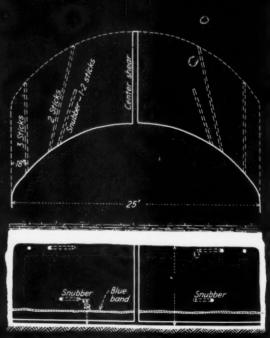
Drilling pattern for a center-sheared place with short snubbers, New Orient mine.
